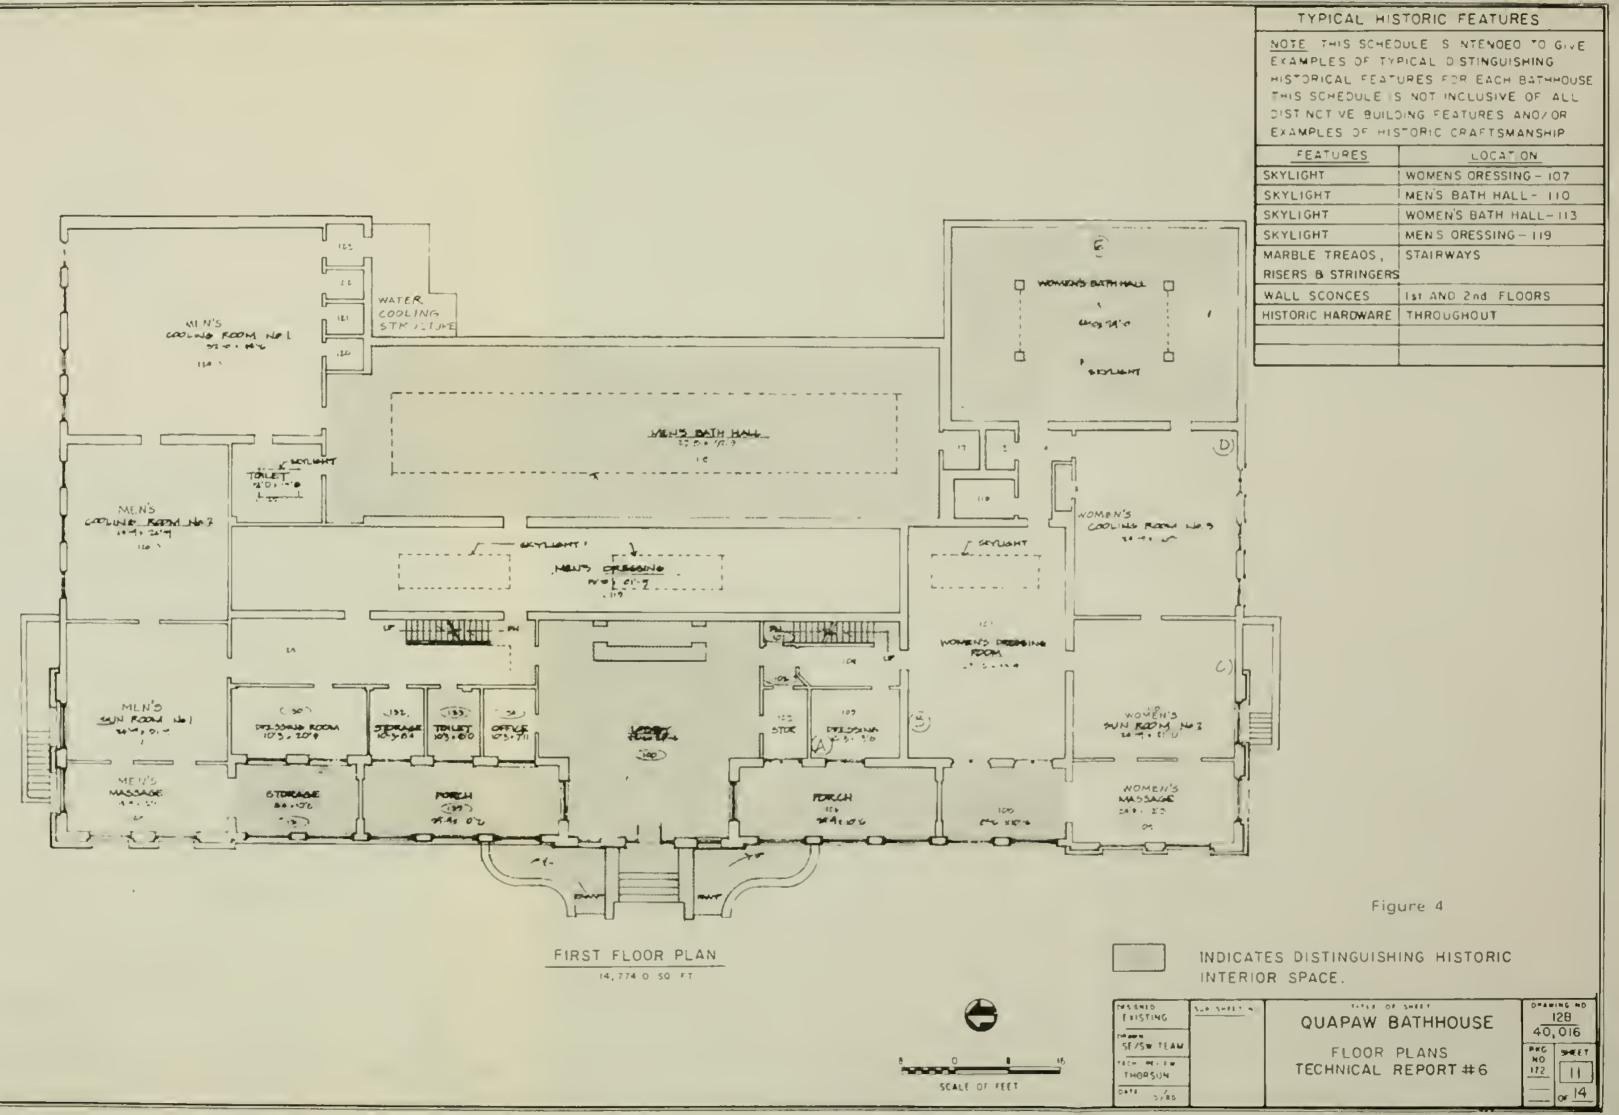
Quapaw Bathhouse, 1984 (Source: Historic American Buildings Survey)
